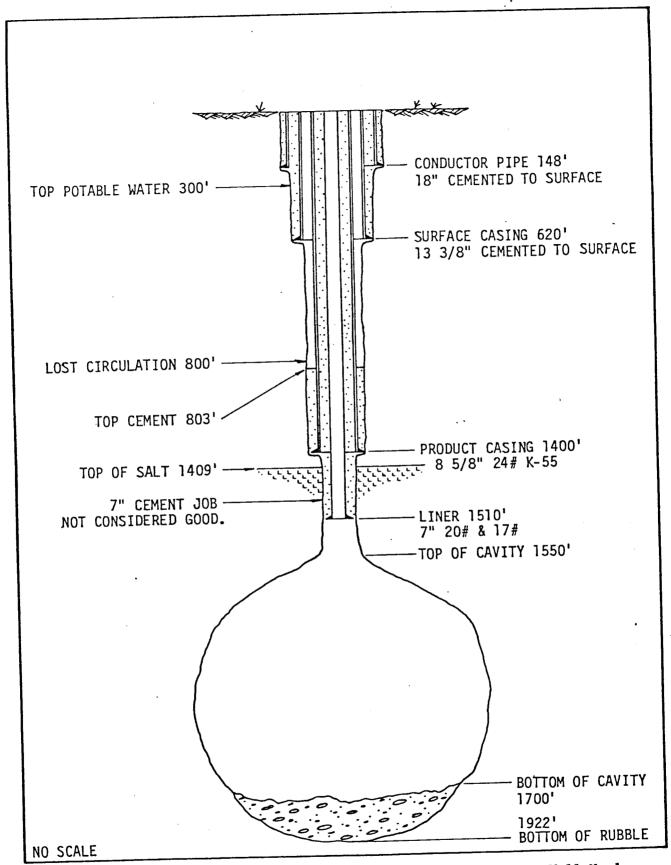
Sketch Showing Present Construction of Storage Well No.1
